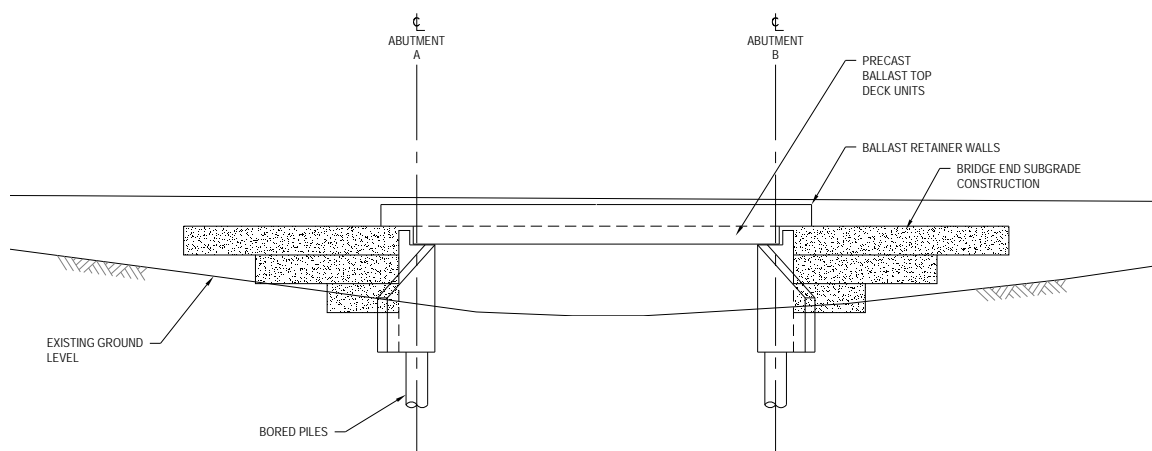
Proposed Underbridge at chainage 209.989 kilometres Design Schematic
